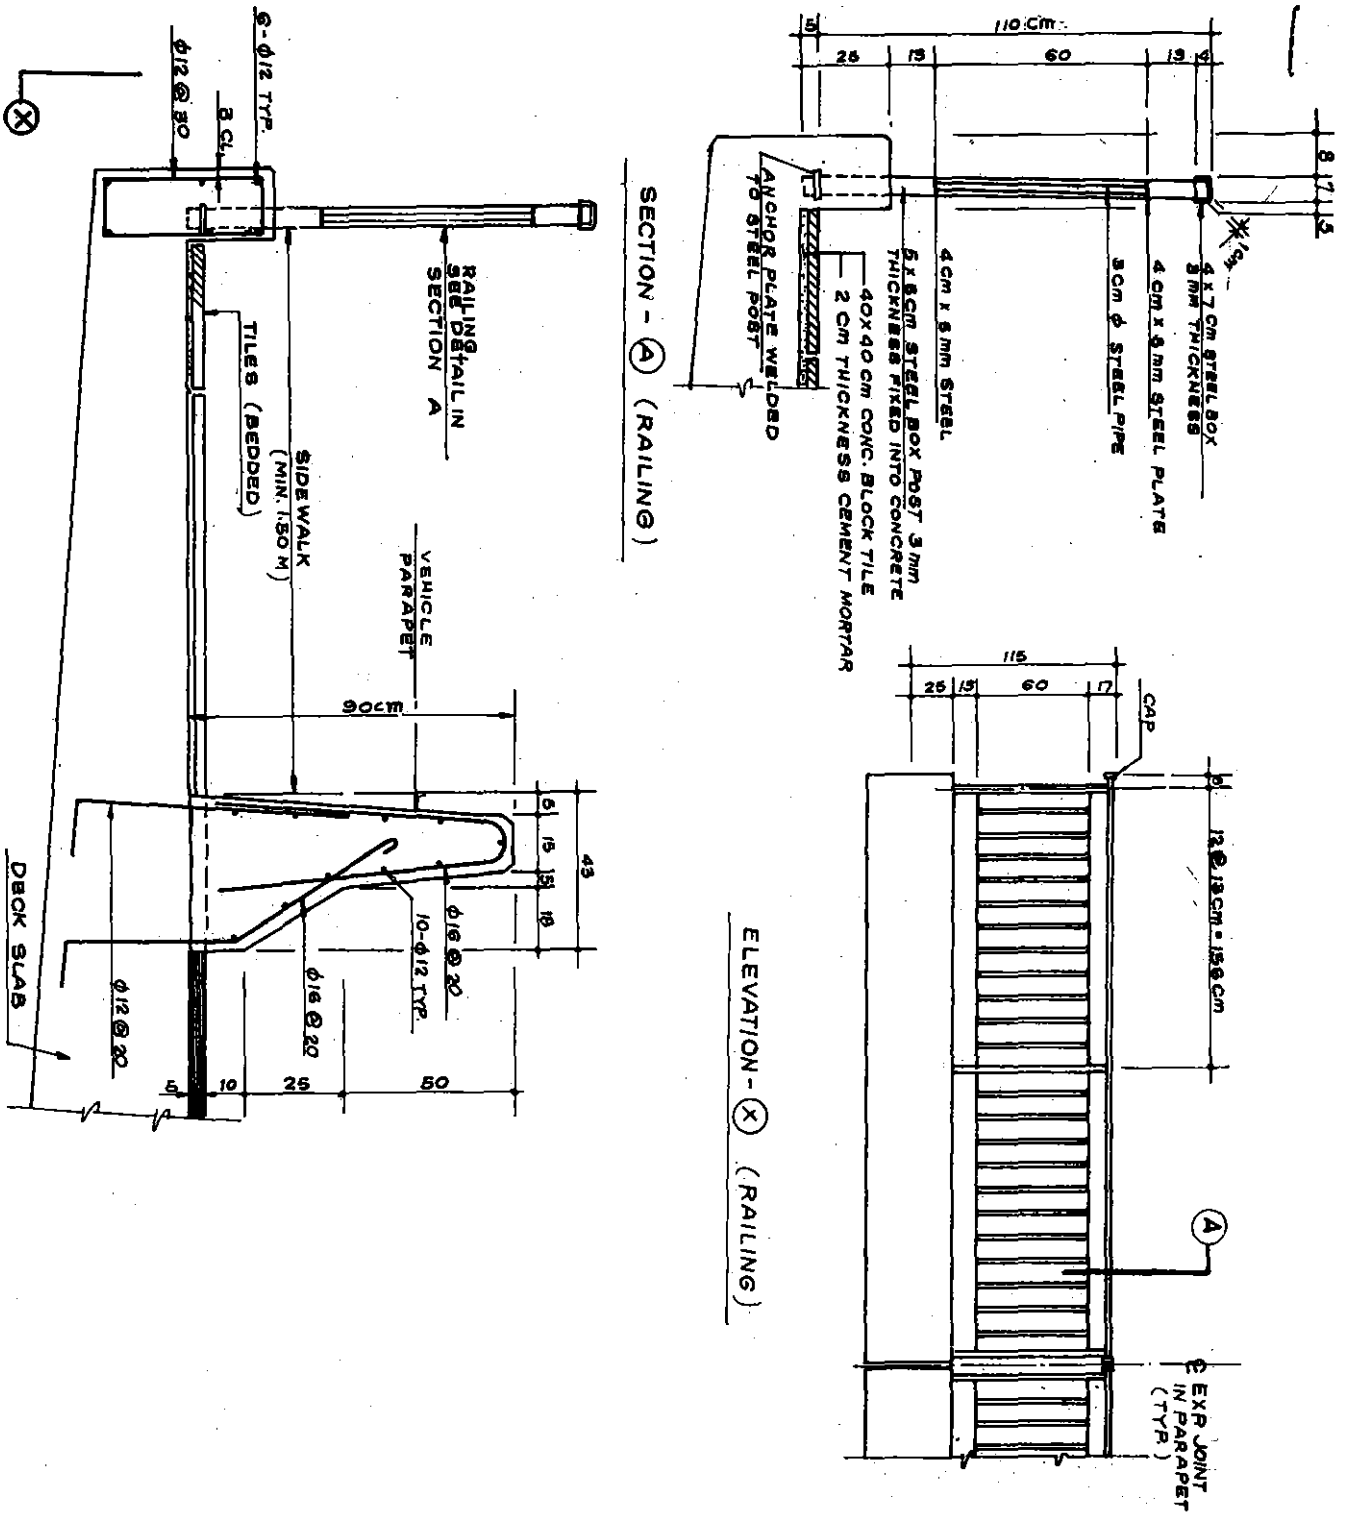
Vehicle-Parapet and railing for bridge with side-walk (slab reinforcement not shown.)
